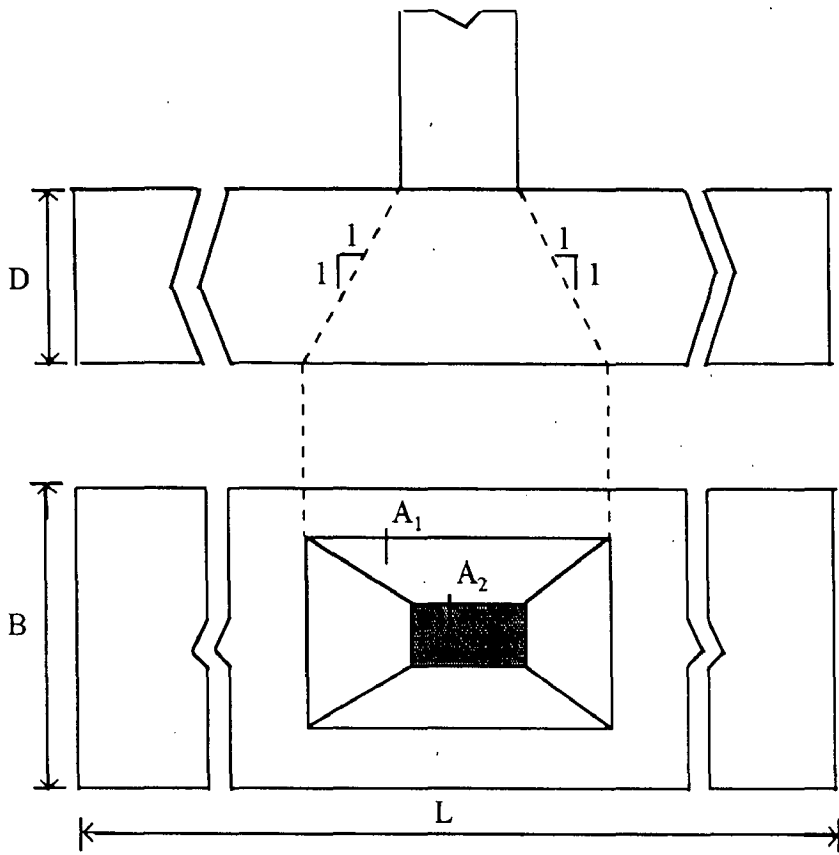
Load Dispersion in the Footing for Bearing Stress Calculation
